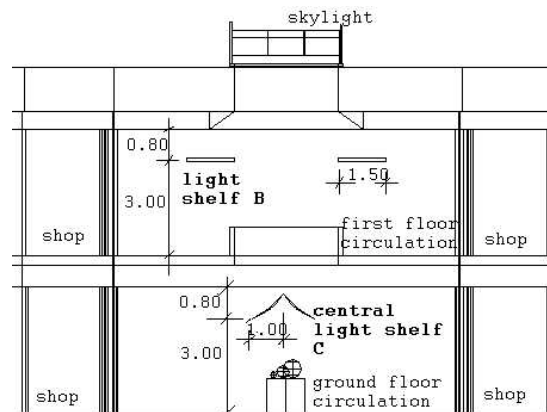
Transversal cross section in the studied area of the building, showing Light shelf "b" (flat) in the first floor
